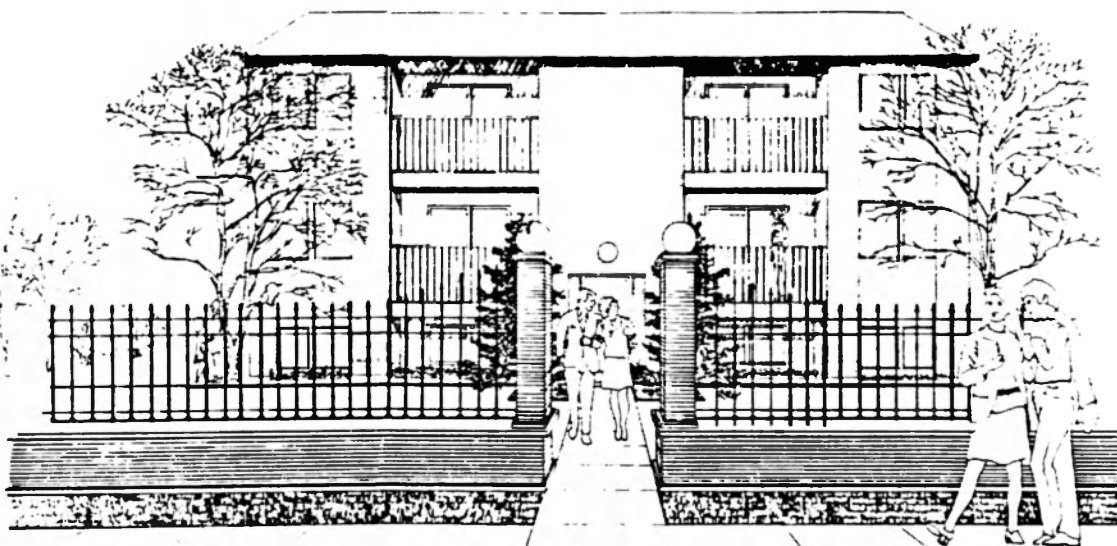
907 Vattier Street. (Mertz, 1987)
